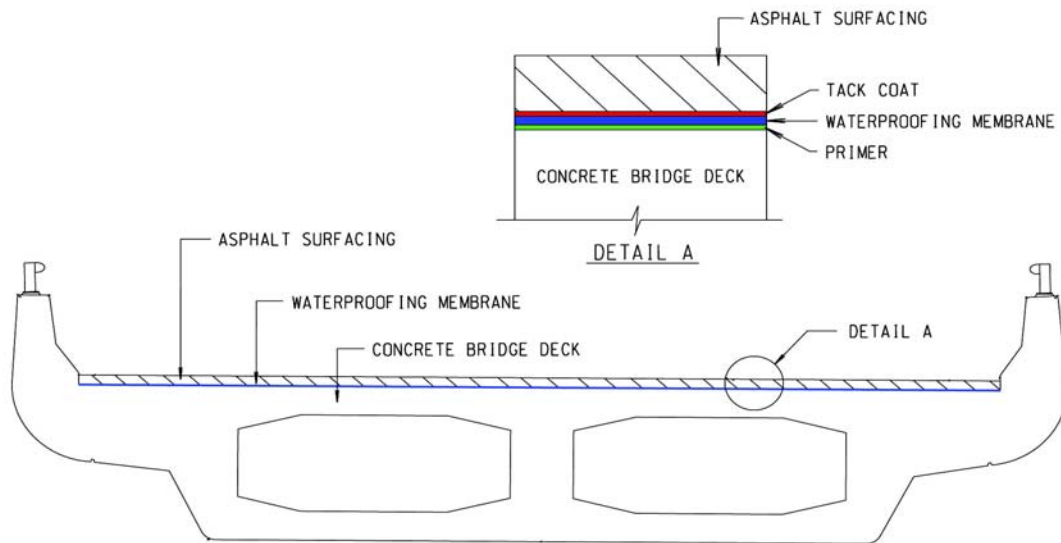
Typical cross section of asphalt surfacing and bridge deck waterproofing membrane on a concrete bridge
